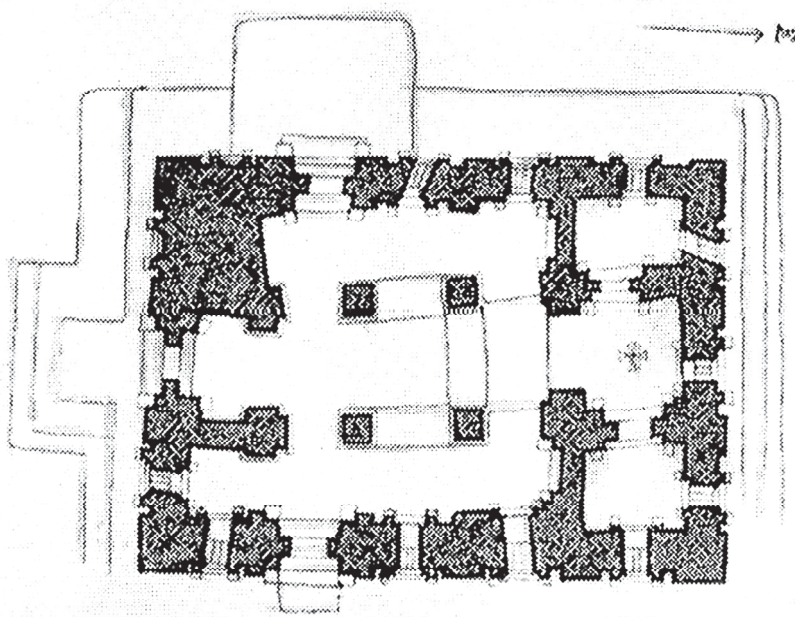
Church of Lalibäla Libanos, Wällo, floor plan; after L. Bianchi Barriviera
